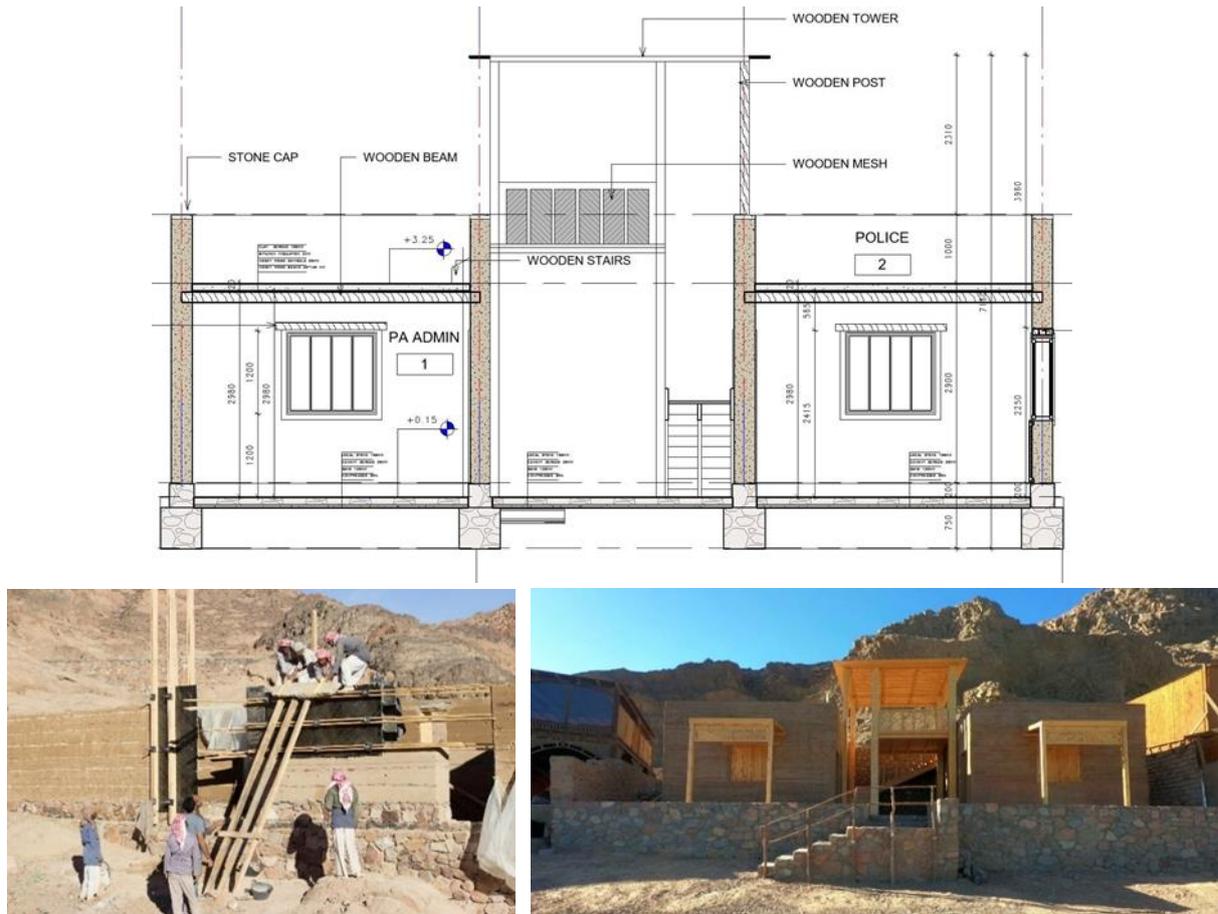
Abu Galoum Protectorate construction plan and section as designed by the Egyptian design and build company “Hand Over”.
